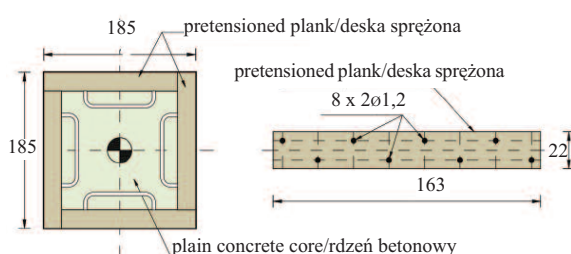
Idea of prestressing using prestressed concrete plank inserts [9]
